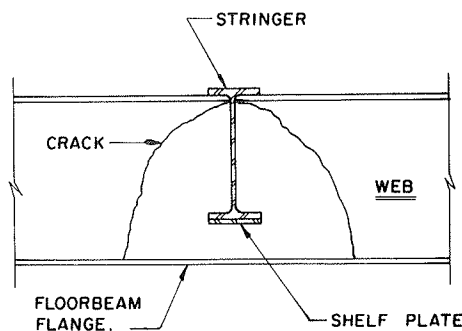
Floor-beam web fatigue cracks.
